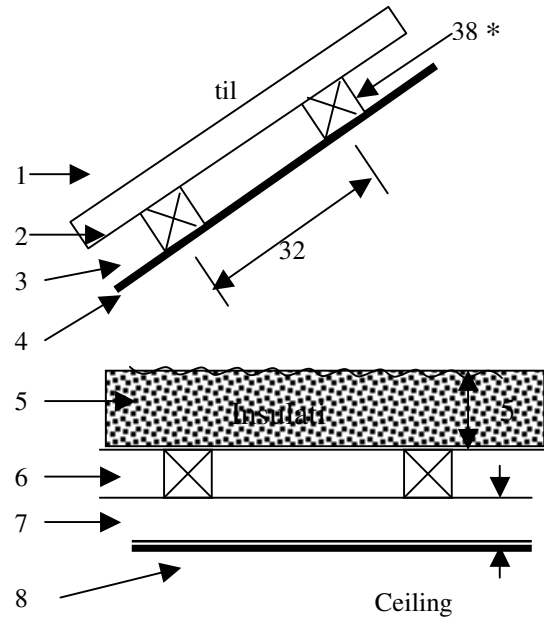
Roof / ceiling combination for an H 130 type house in Botswana.
